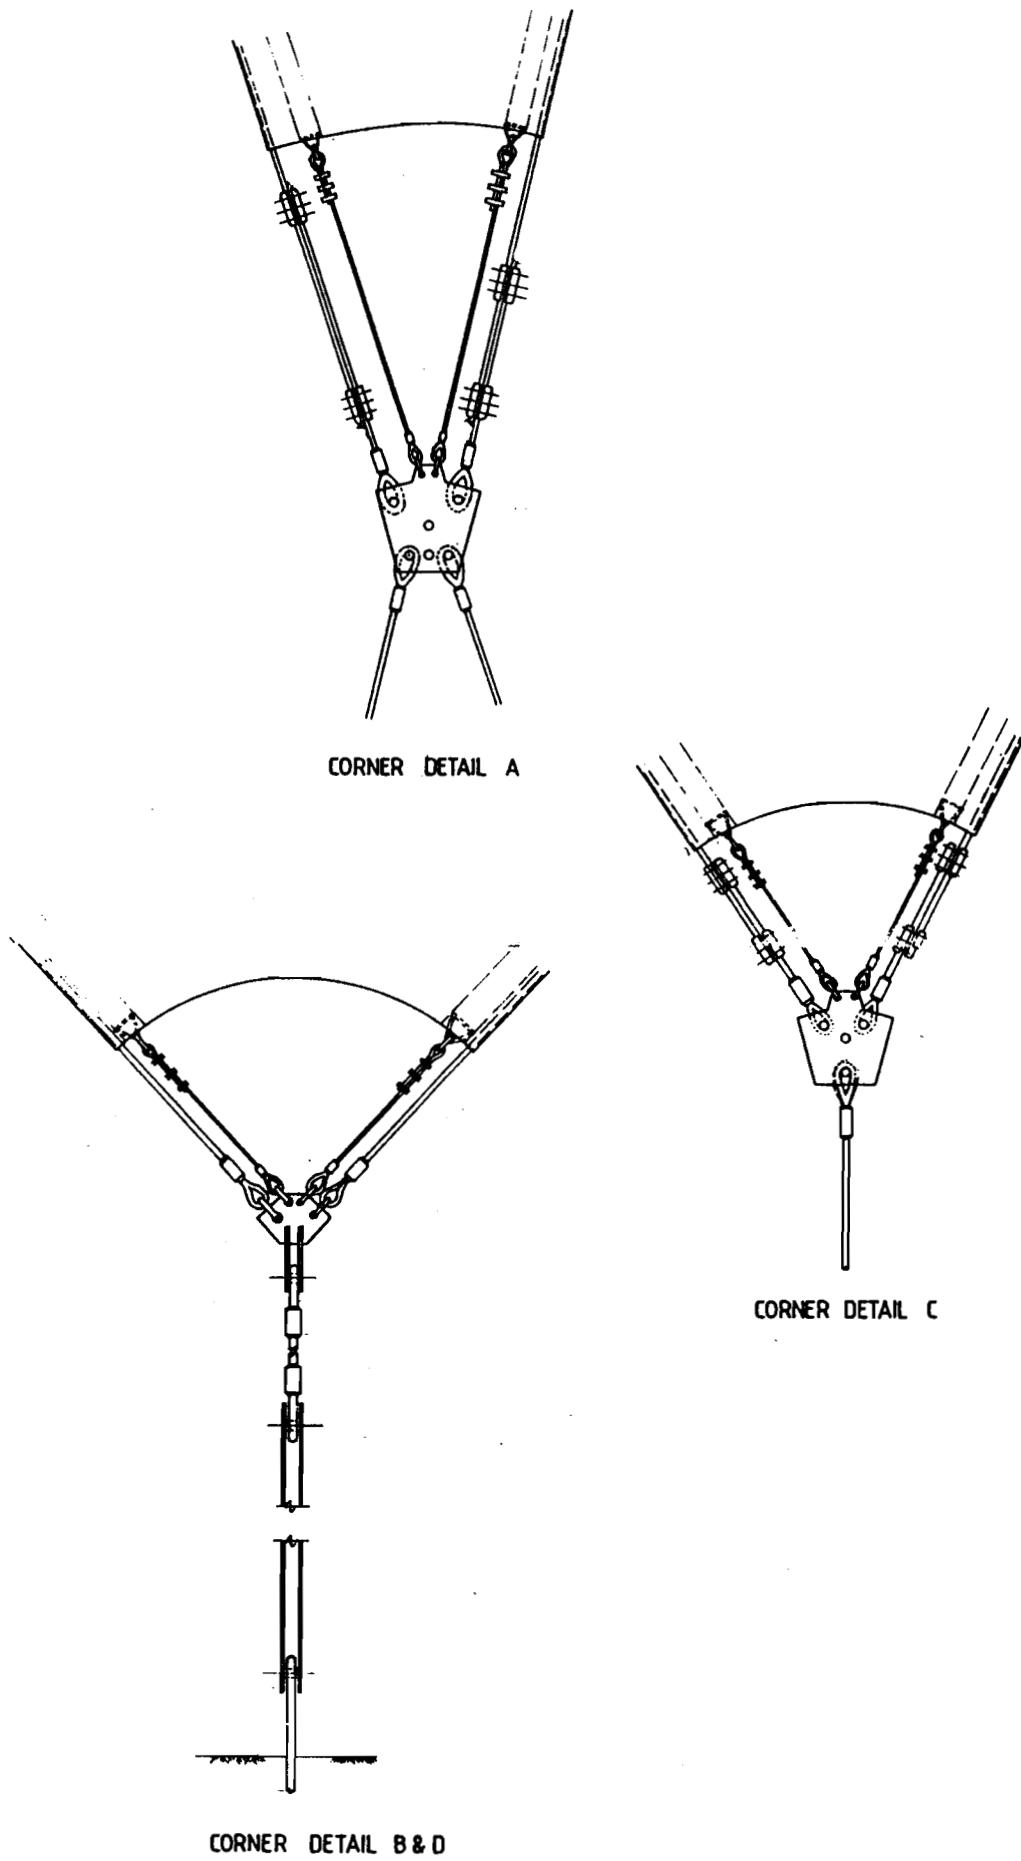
Corner detail showing edge cable/membrane, tangential stressing arrangement and corner plate.
